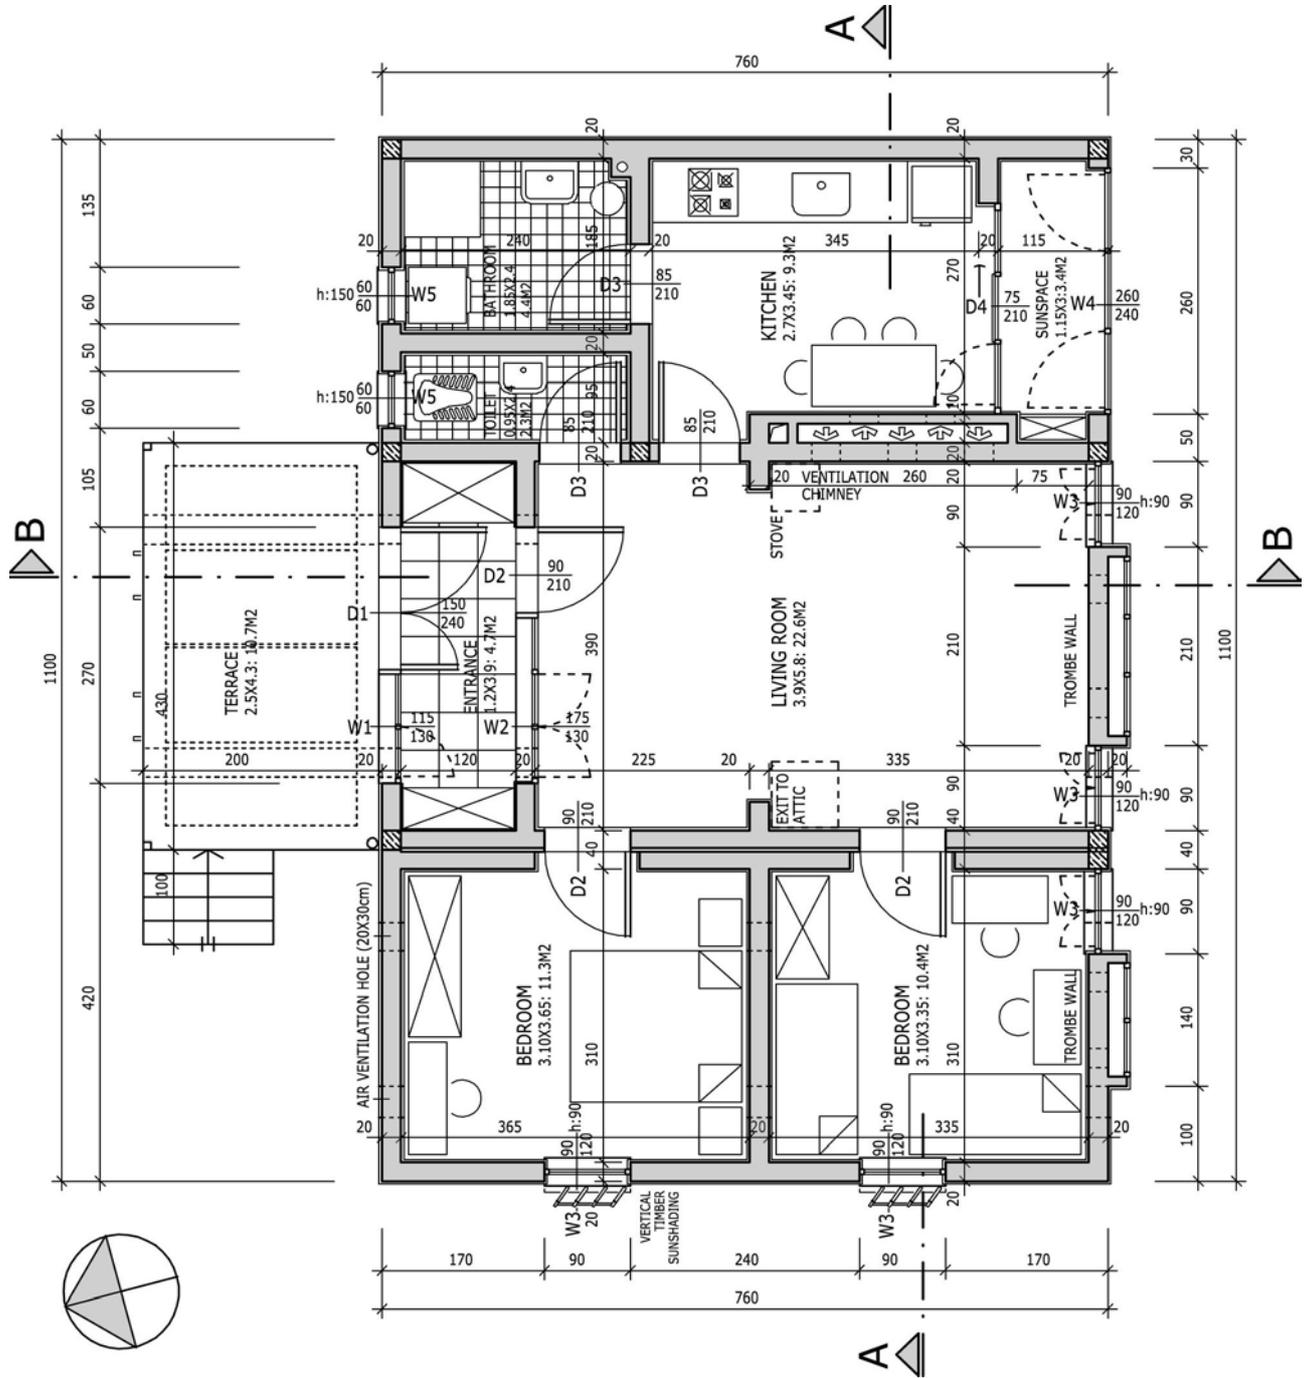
Plan of sample dwelling— type D₁'—of load bearing construction system, made of brick; Scale 1/80
